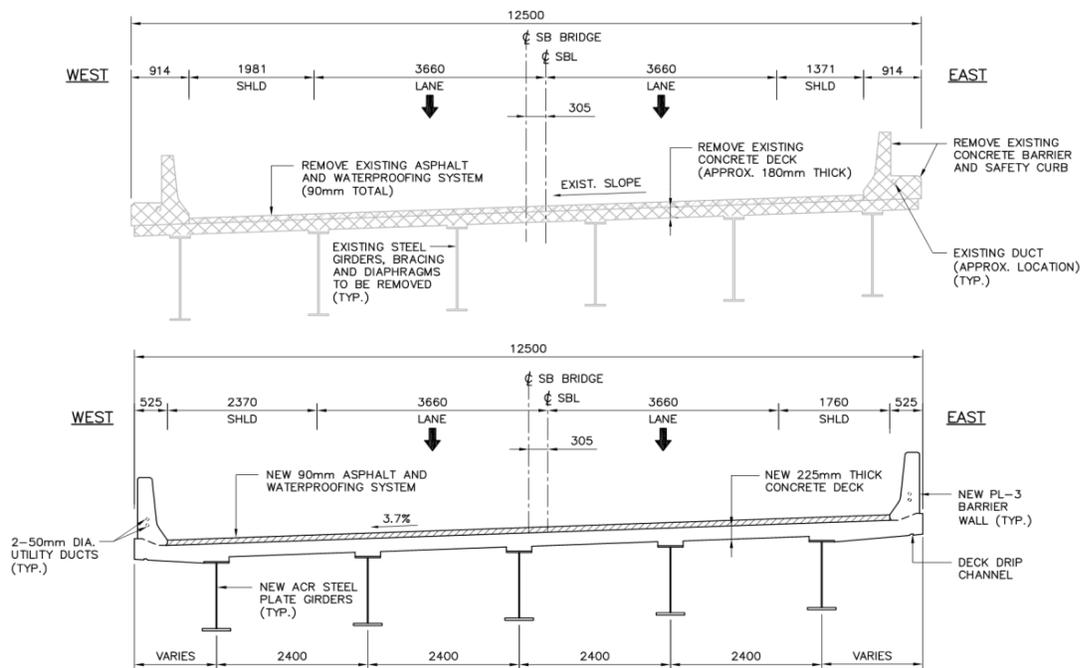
Typical cross section of existing and new superstructures (southbound structure shown, northbound similar).
